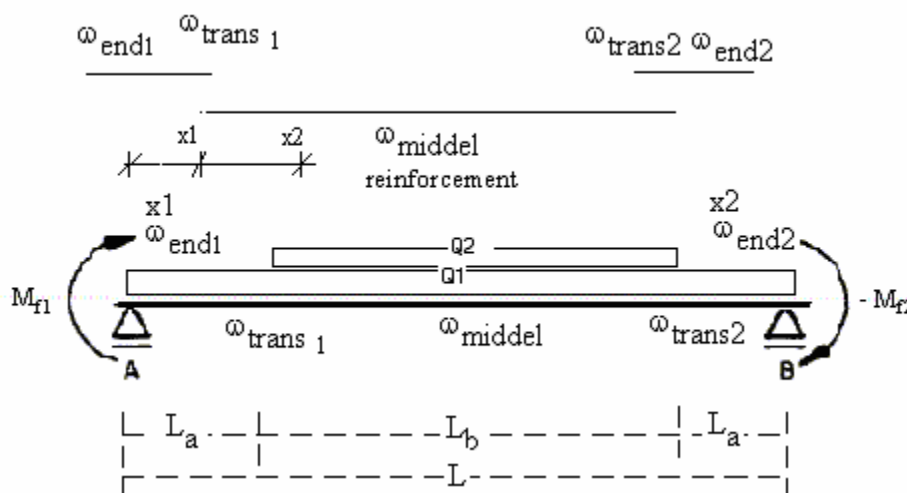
Simple precast concrete beam subjected to fixed end moment and uniformly distributed load
